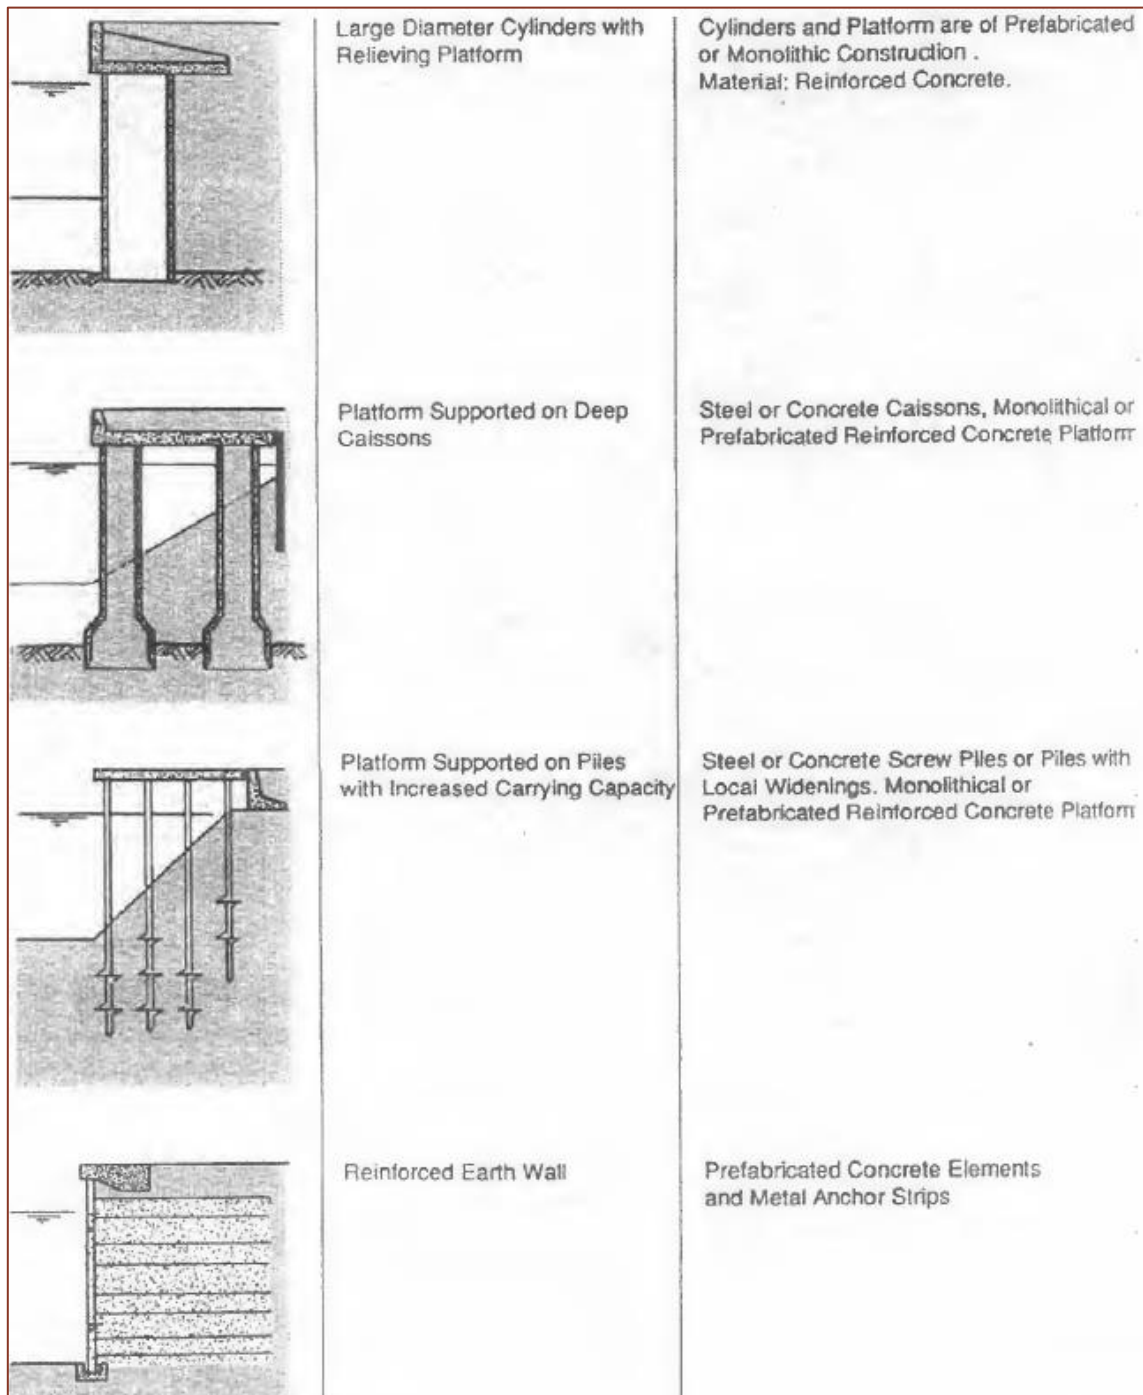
Overview of quay walls with a special foundation [Gijt, 2004]
